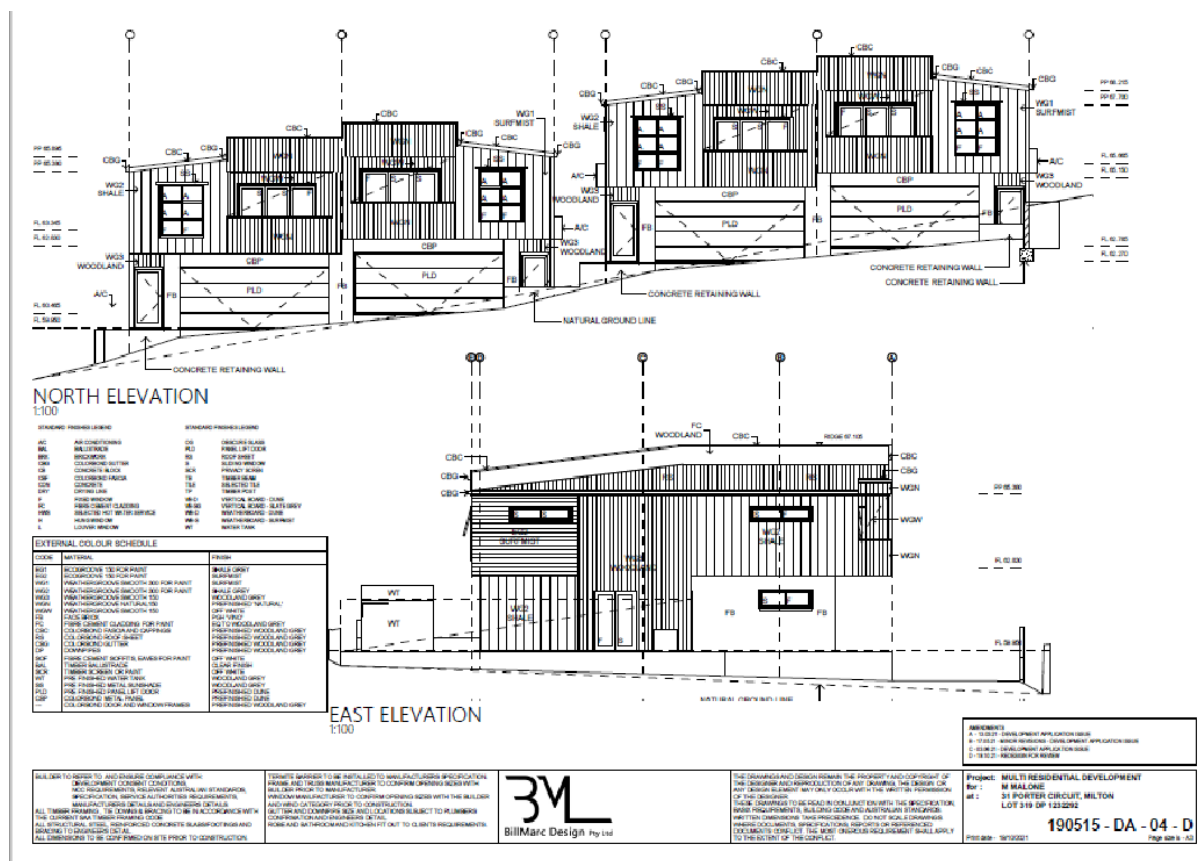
Elevations (north elevations are internal, the east faces the street)
